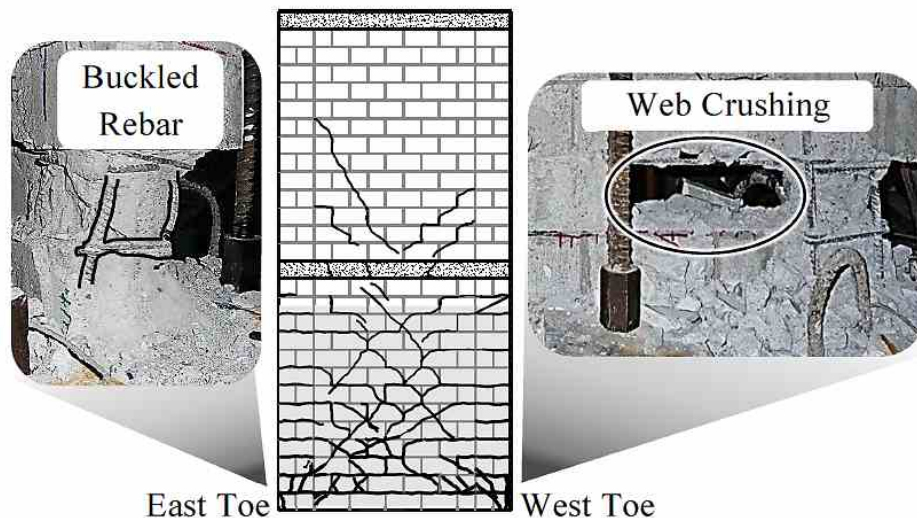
Crack Pattern and Failure Mechanisms of Wall 2
